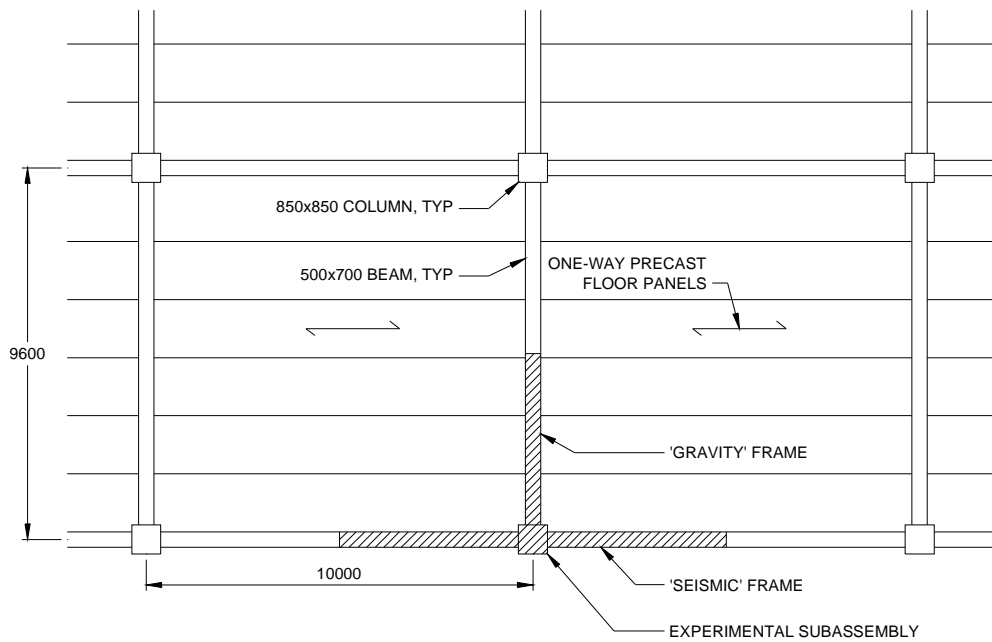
A plan view of the prototype structure, showing the location of the experimental subassembly.
